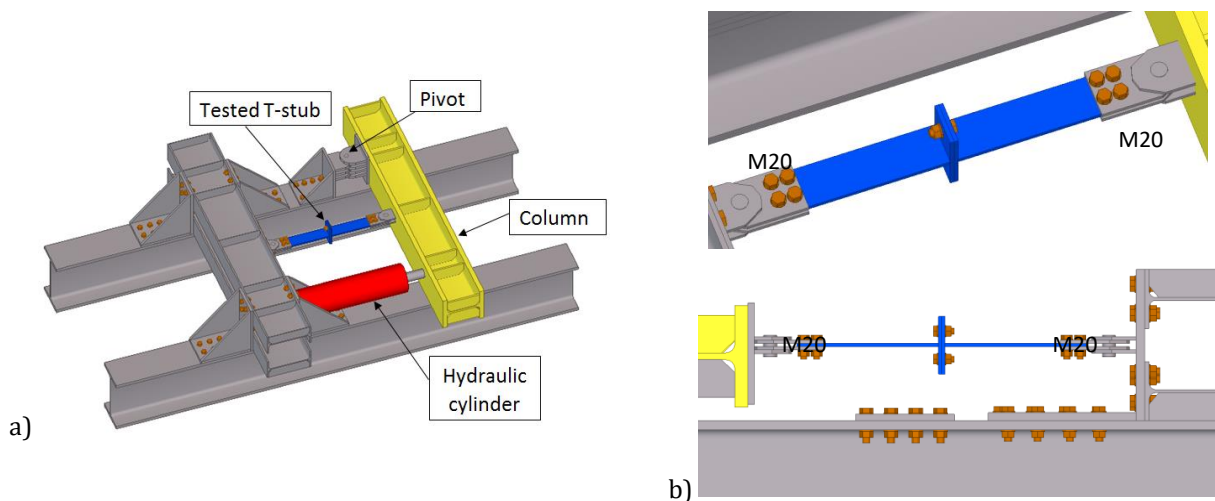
Experimental Layout: a) general view; b) detailed views of the tested T-stub.
